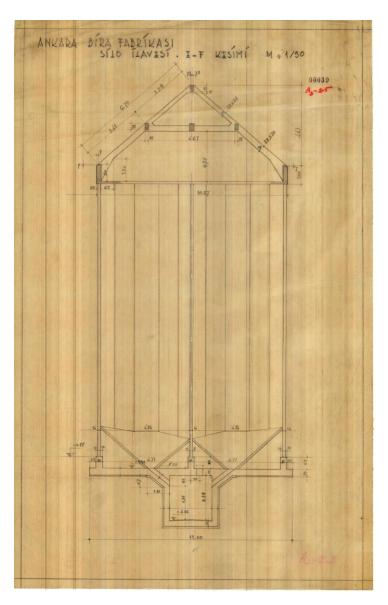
Drawing of the second addition composed of 8 dodecagon storage units, E-F Section, New Construction Section in General Directorate of TEKEL, 1971 (Source: TTA Archive)
